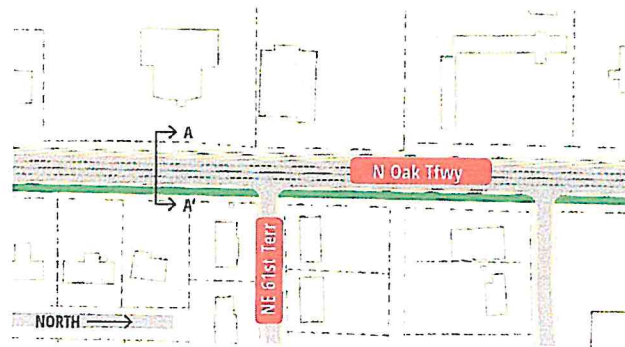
TYPICAL 4-LANE CONFIGURATION - PLAN
